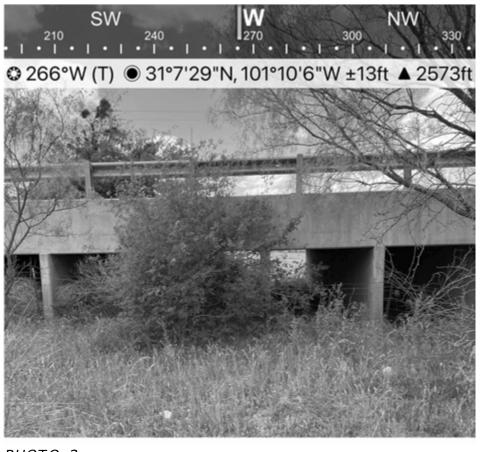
SHRUBBERY AND DEBRIS BLOCKING BARRELS, LOOKING WEST.
